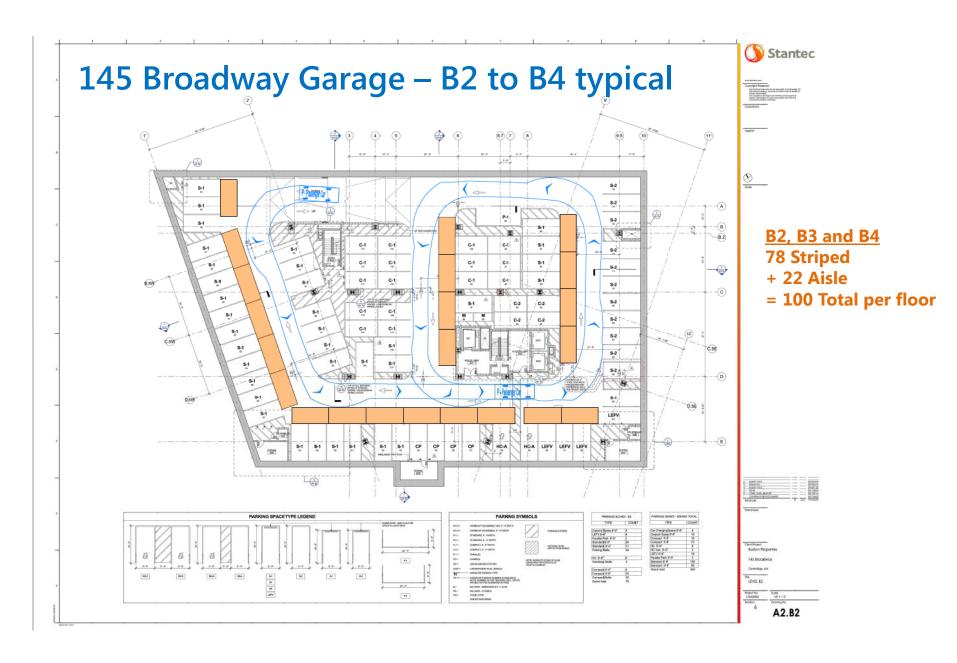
Proposed Layout 145 Broadway Garage (457 Spaces)
